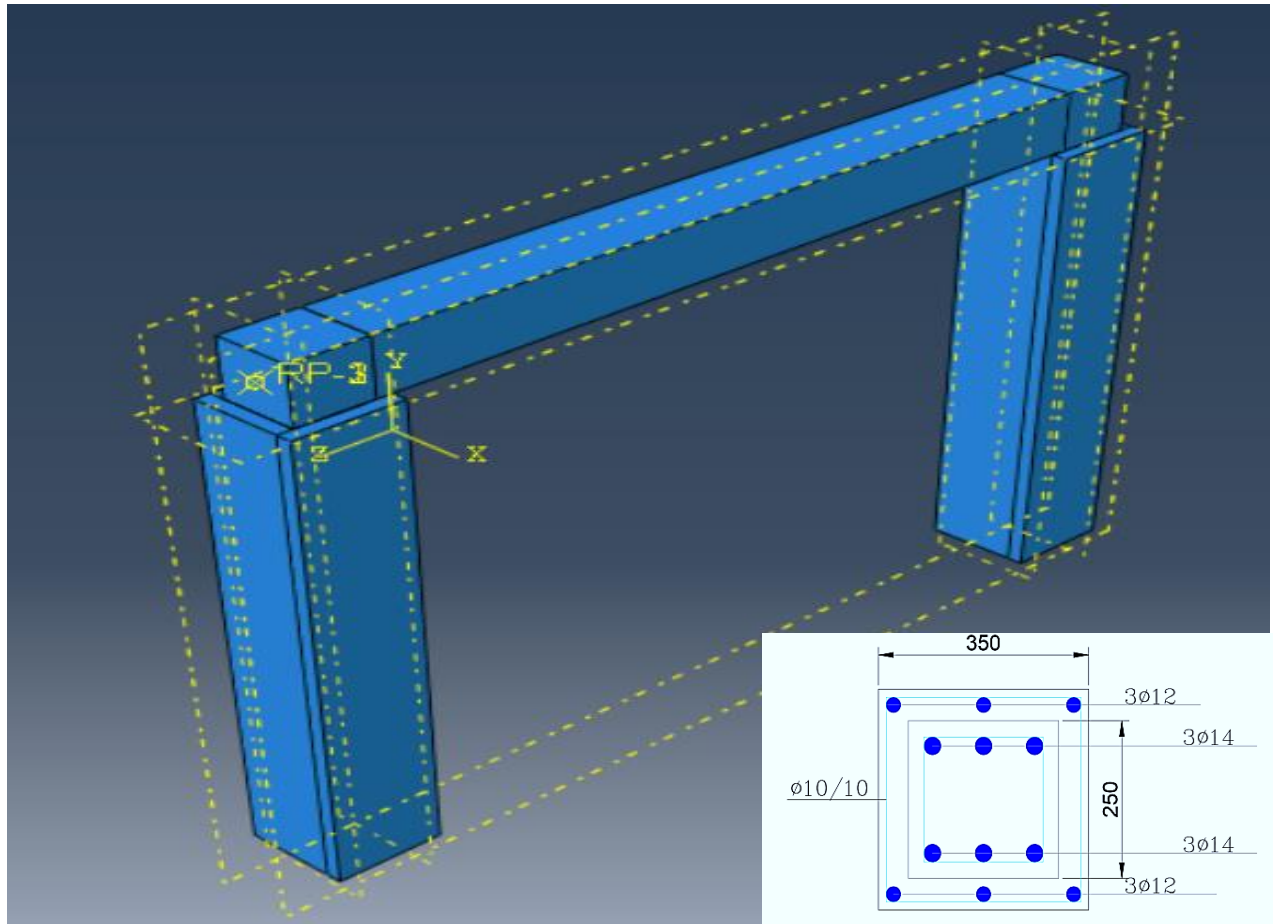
Concrete Jacketing Configuration and Reinforcement Details of the Strengthened RC Frame
